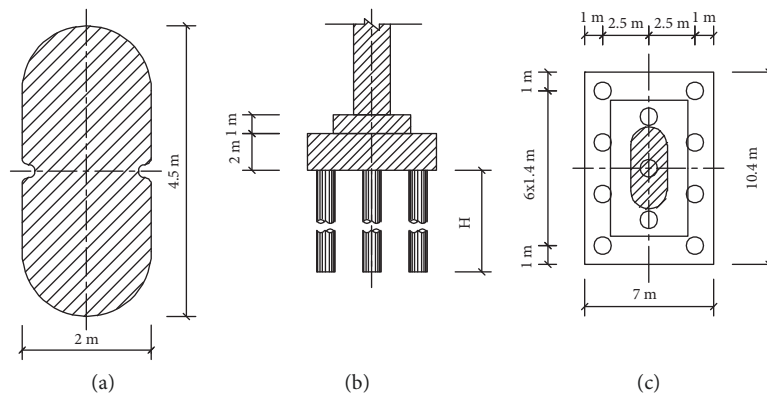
Pier and foundation: (a) cross-section of a pier; (b) longitudinal section; (c) overall plan.
